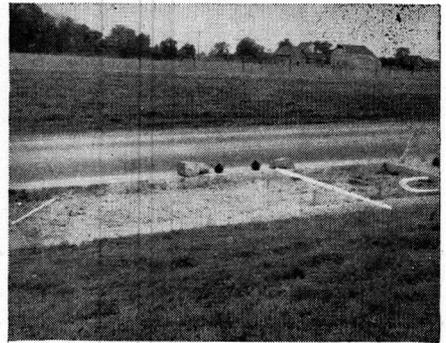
Subgrade After Removal of Pavement at Joint Which had been Previously Treated. White lines at ends show extent of coverage by cement slurry. Joint and locations of holes for treatment are indicated by white line and stakes.
